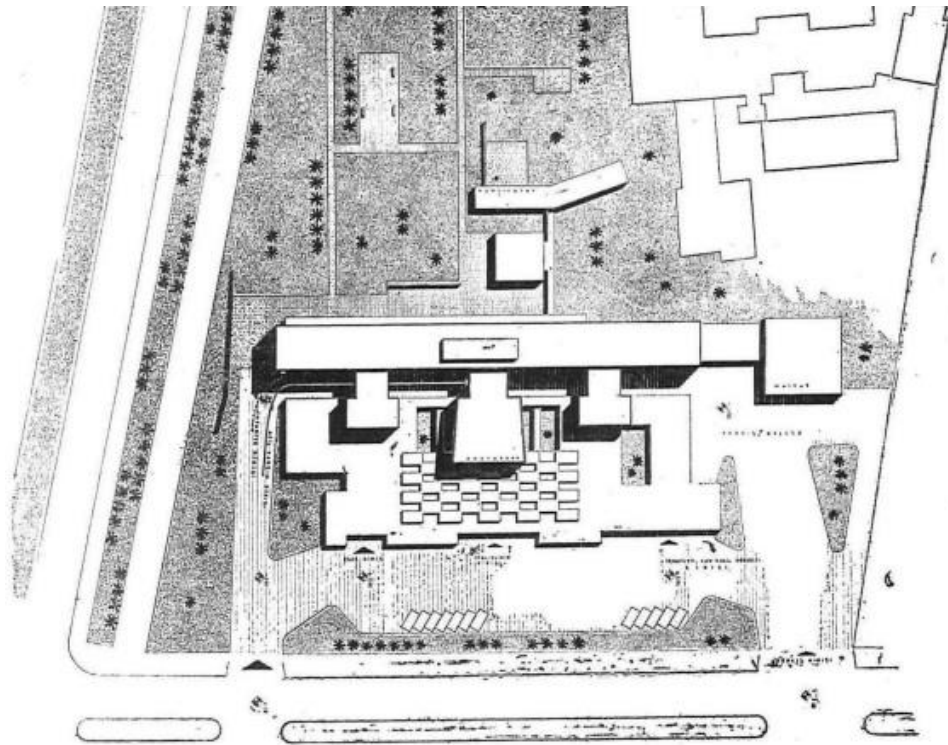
Site Plan, Vakıf Guraba Hospital
